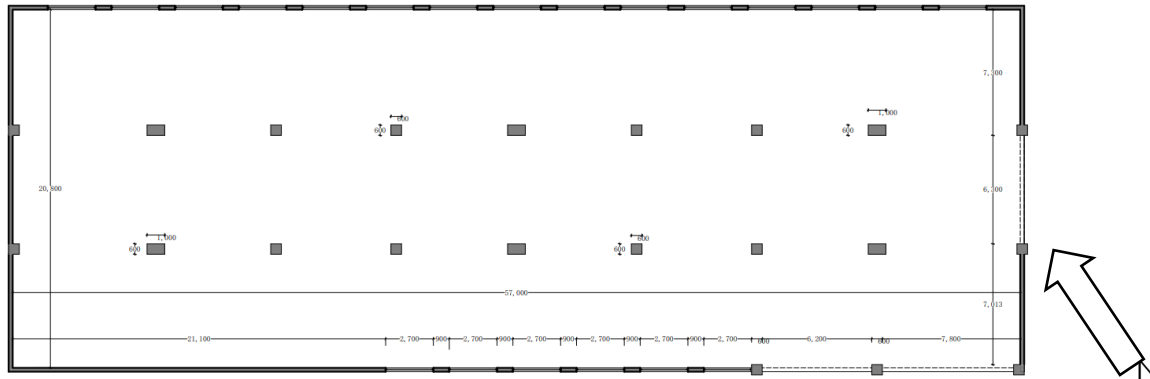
Floor plan of HALL H (57m x 20.8m, WFR = 11%)
